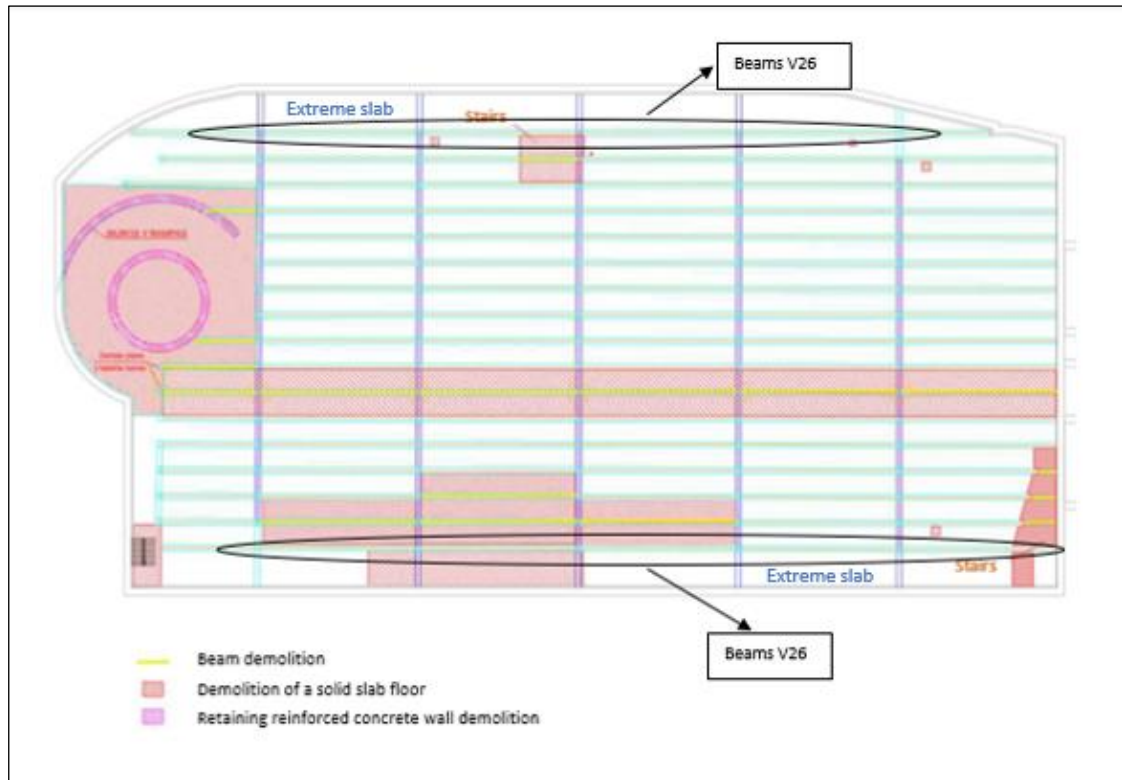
Beam V26 Location, source: (SIGMA & Servicios de Ingeniería, 2016).
